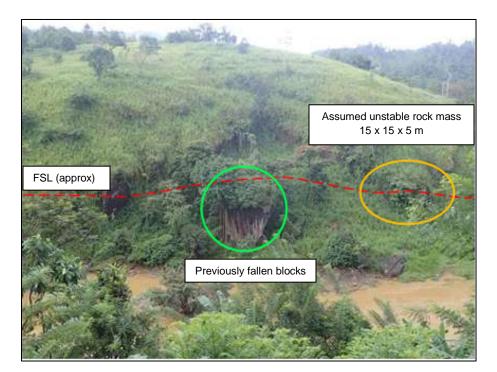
Unstable rock mass on right bank 1.35 km upstream of dam site
